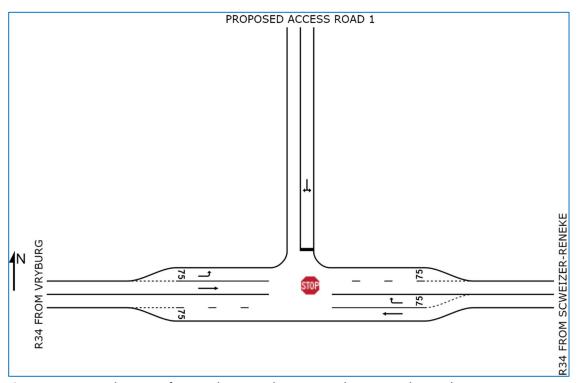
Proposed Layout of R34 and Proposed Access Road 1 – Kenneth Morolong Street
